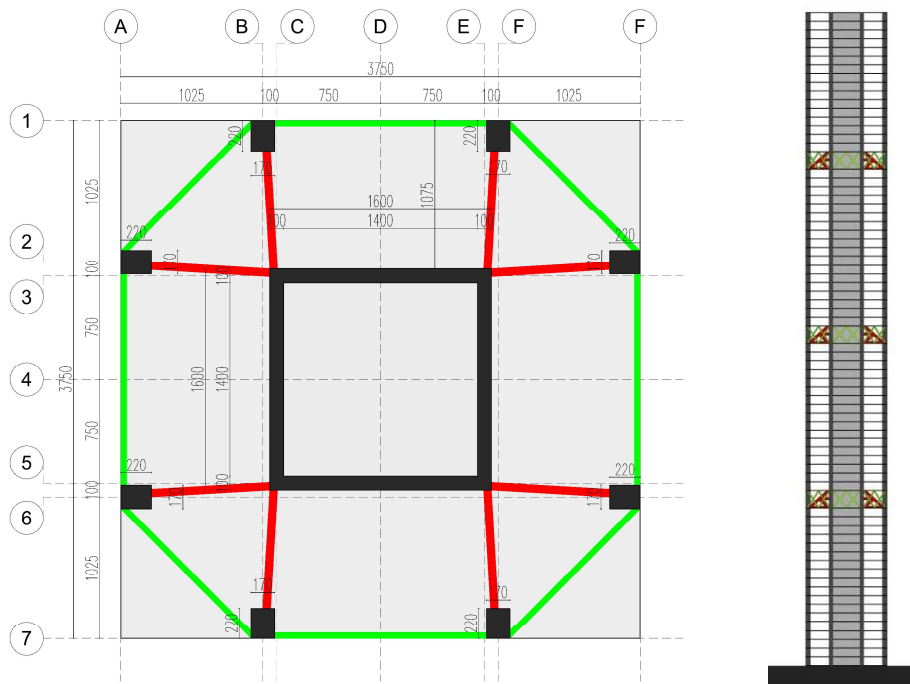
Typical floor plan and elevation of model "OF_OPT_3c" with outriggers and belt trusses
